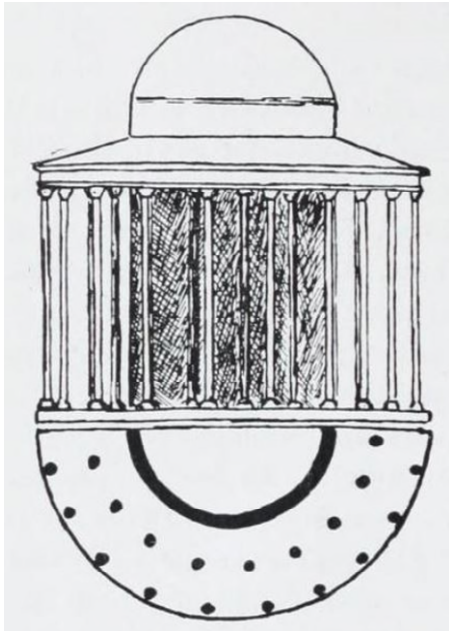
Sketch-plan and elevation of the Marneion at Gaza
